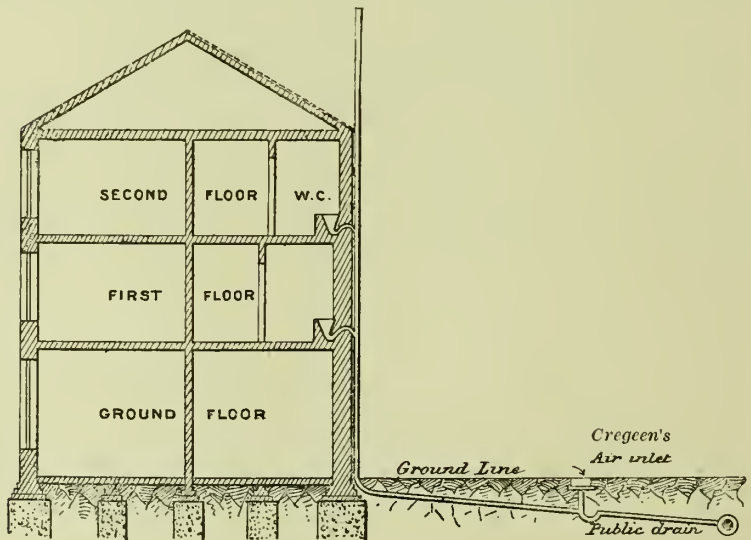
House Drainage: Syphon and Air Inlet employed instead of Disconnecting Pit.
